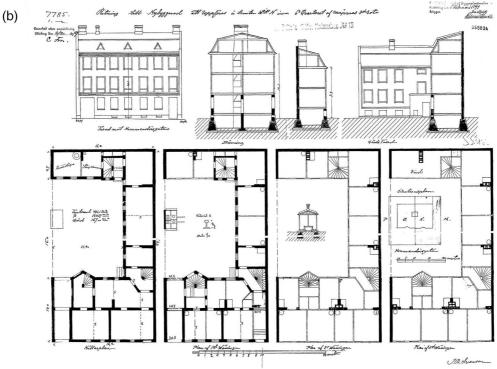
(a and b) Aerial view and plans of the Kolumbus block, built by builders J. H. and David Jakobsson in 1897–1900. Located just one block away from Djurgårdsgatan, the Kolumbus governor's houses had back-to-back courthouses, small courtyards and repeated facades and were built for ordinary workers. This is the only one of this speculative type still remaining. It was saved by inhabitants in 1979 and restored. Photo by Krister Engström 2022.
